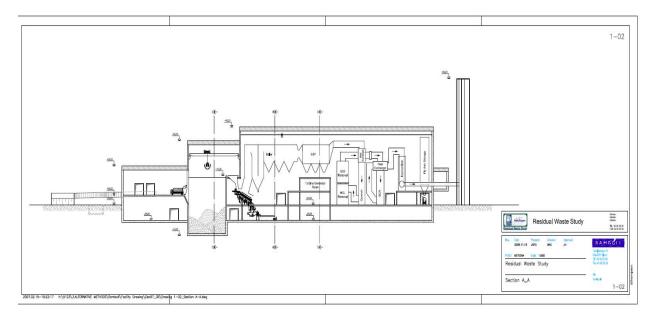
Elevation View of Conceptual Thermal Treatment Facility
